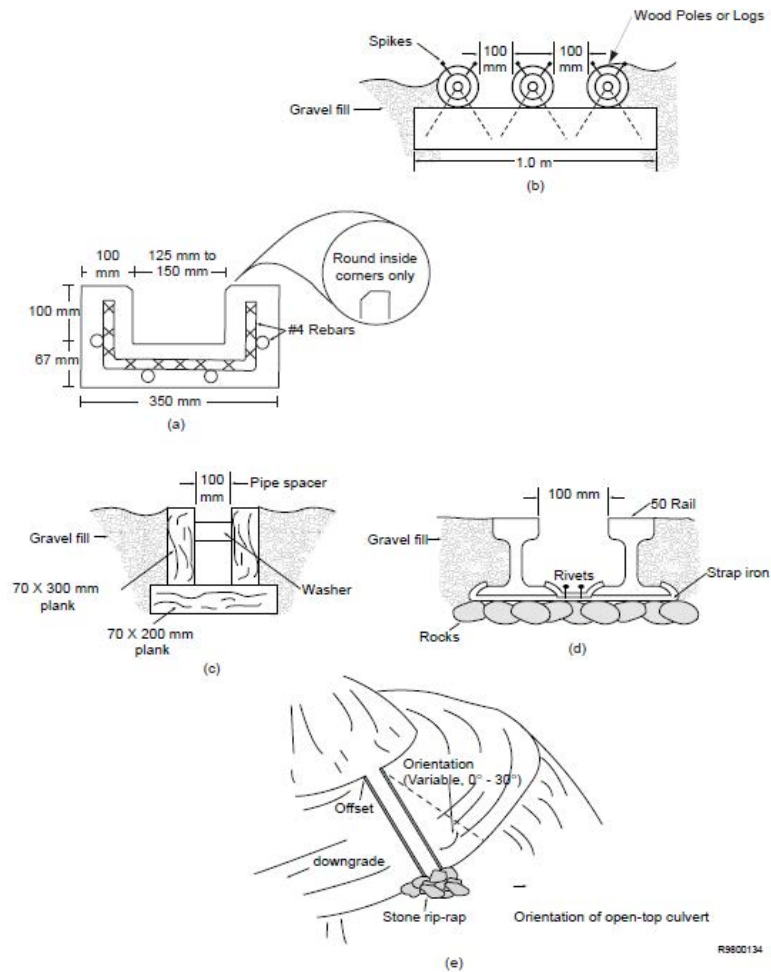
Various open top culvert surface cross drain designs: (a) concrete, (b) pole, (c) wood box; (d) rail culvert, (e) orientation is typically up to 30 degrees from perpendicular to the direction of travel.
